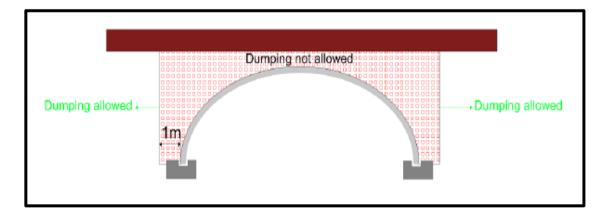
Restrictions on Dumping of Fill Material (BEBO Arch Systems Installation Guide, 2009)
